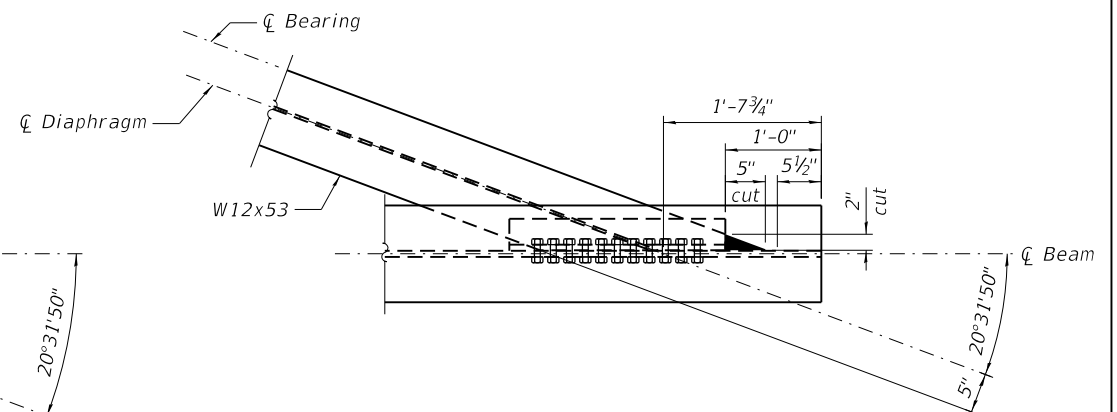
DETAIL OF END DIAPHRAGM SEAT ANGLE FOR BEAMS 1, 3 & 6 AT PIER 3
